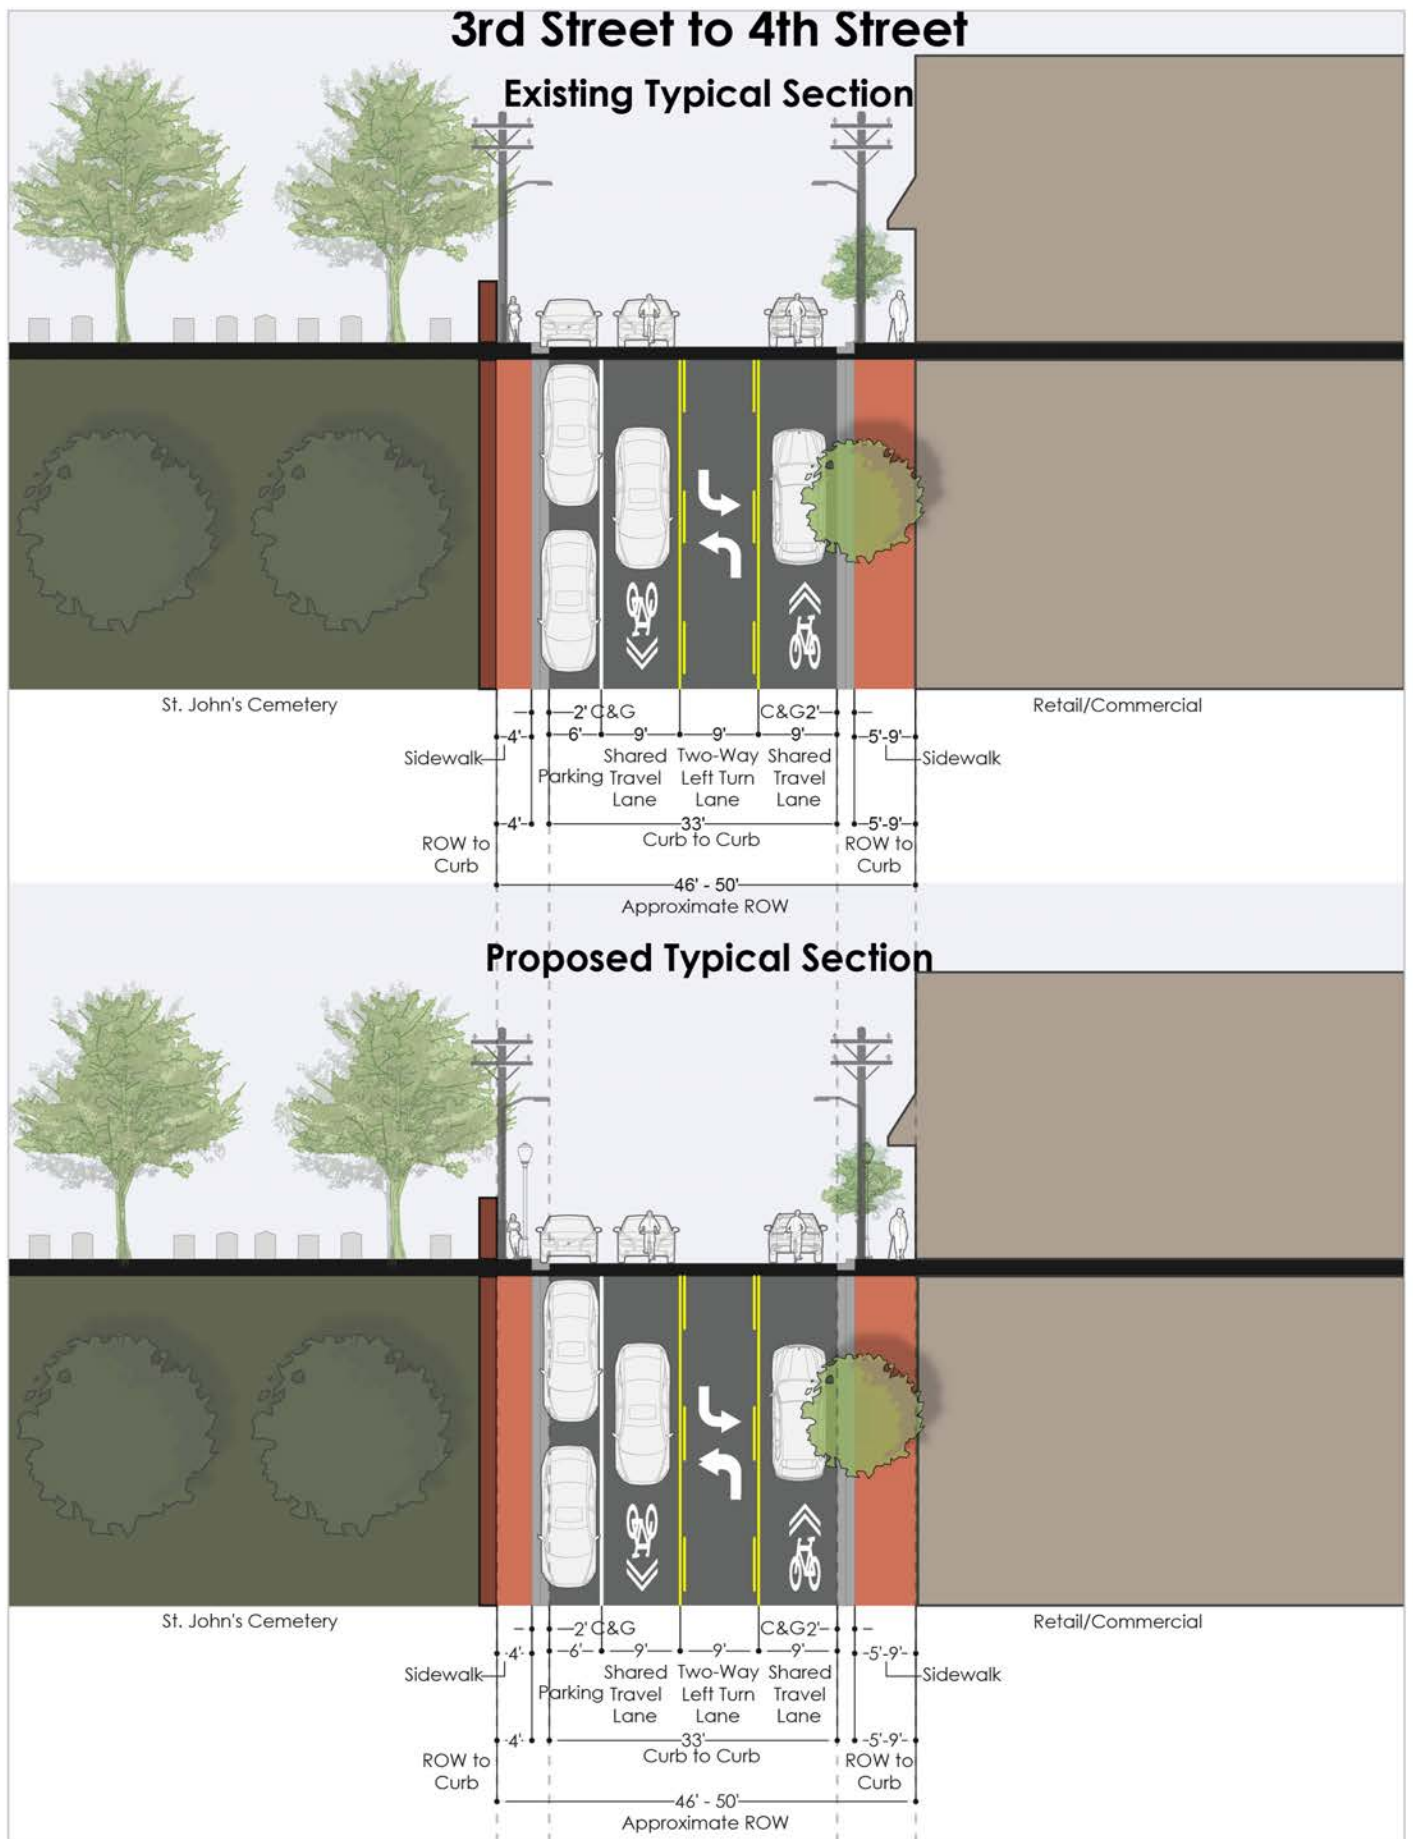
Existing and Proposed Typical Section - 3rd Street to 4th Street (No Change)
